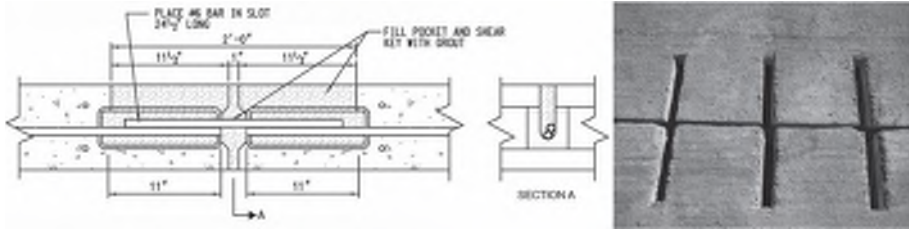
Transverse connection at Live Oak Creek Bridge, Texas (FHWA 2009)
